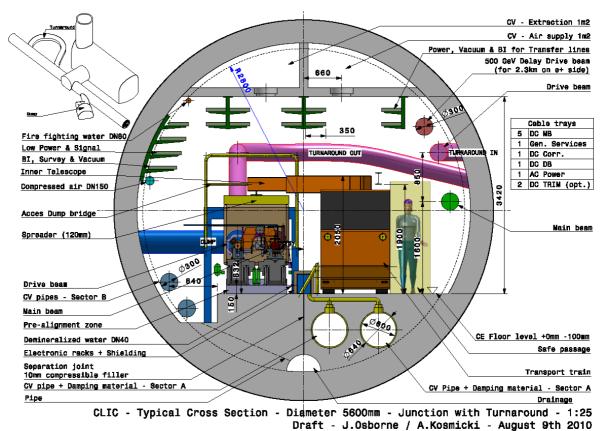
Cross section of CLIC tunnel showing vehicle installing a module
